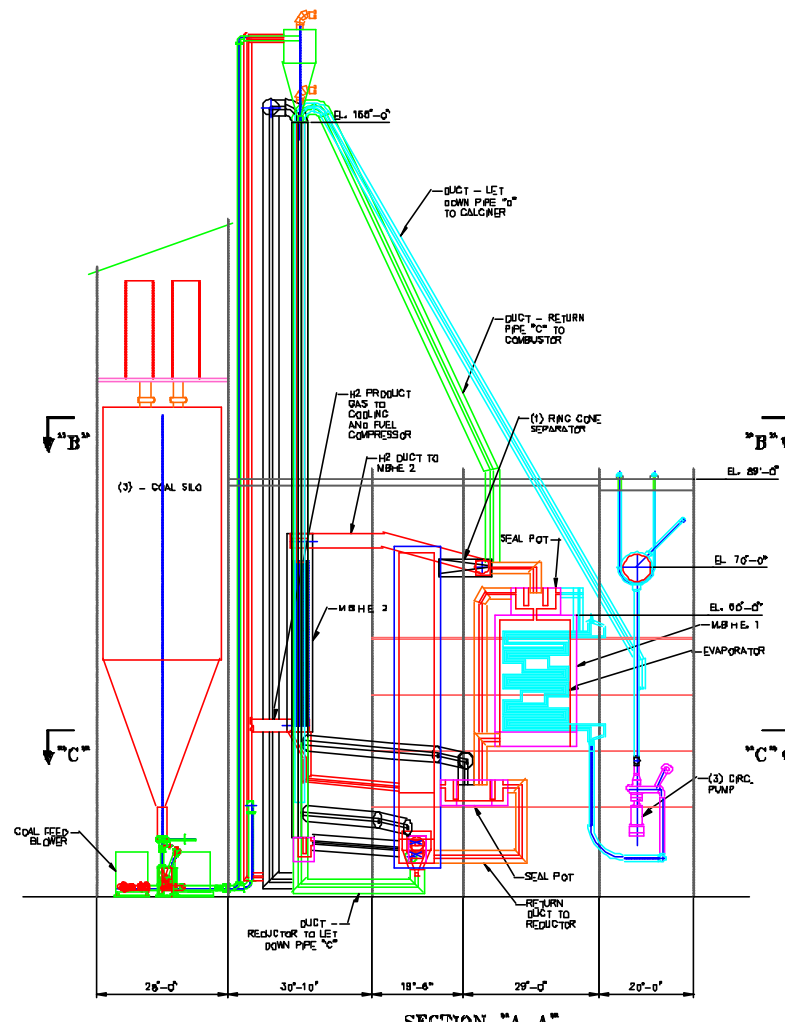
3: Case-13 Gasifier Island General Arrangement Drawing – Side Elevation
